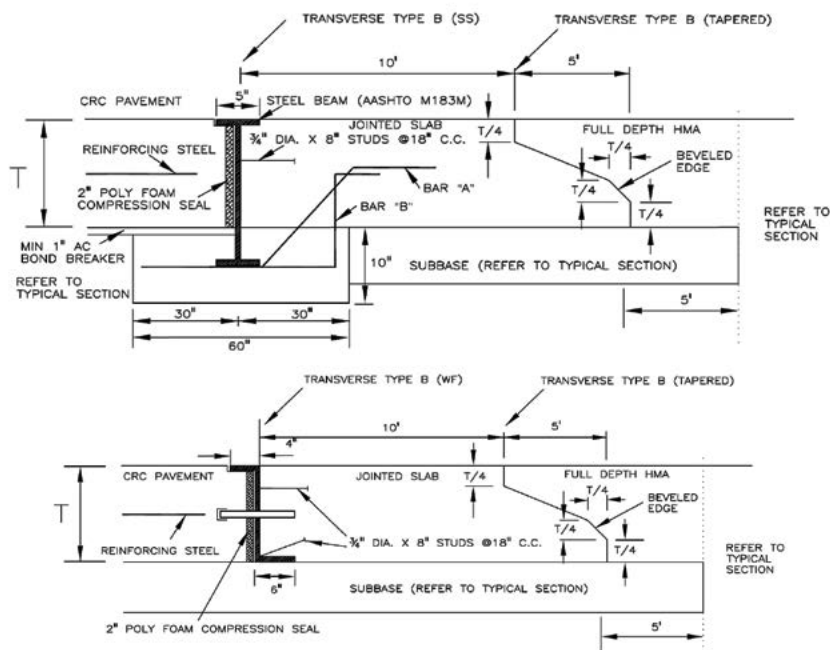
Transition between CRCP and asphalt pavement using a tapered concrete slab.
